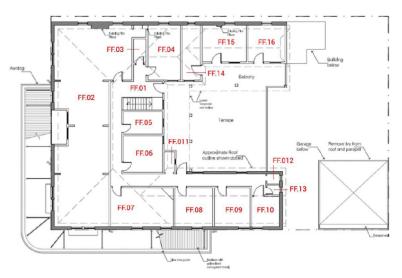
First floor plan. Source: 'Conservation Management Strategy & Statement of Heritage Impacts' report prepared by Colin Israel in December 2017, plan prepared by Dixon Rothschild Architects, 2008.
